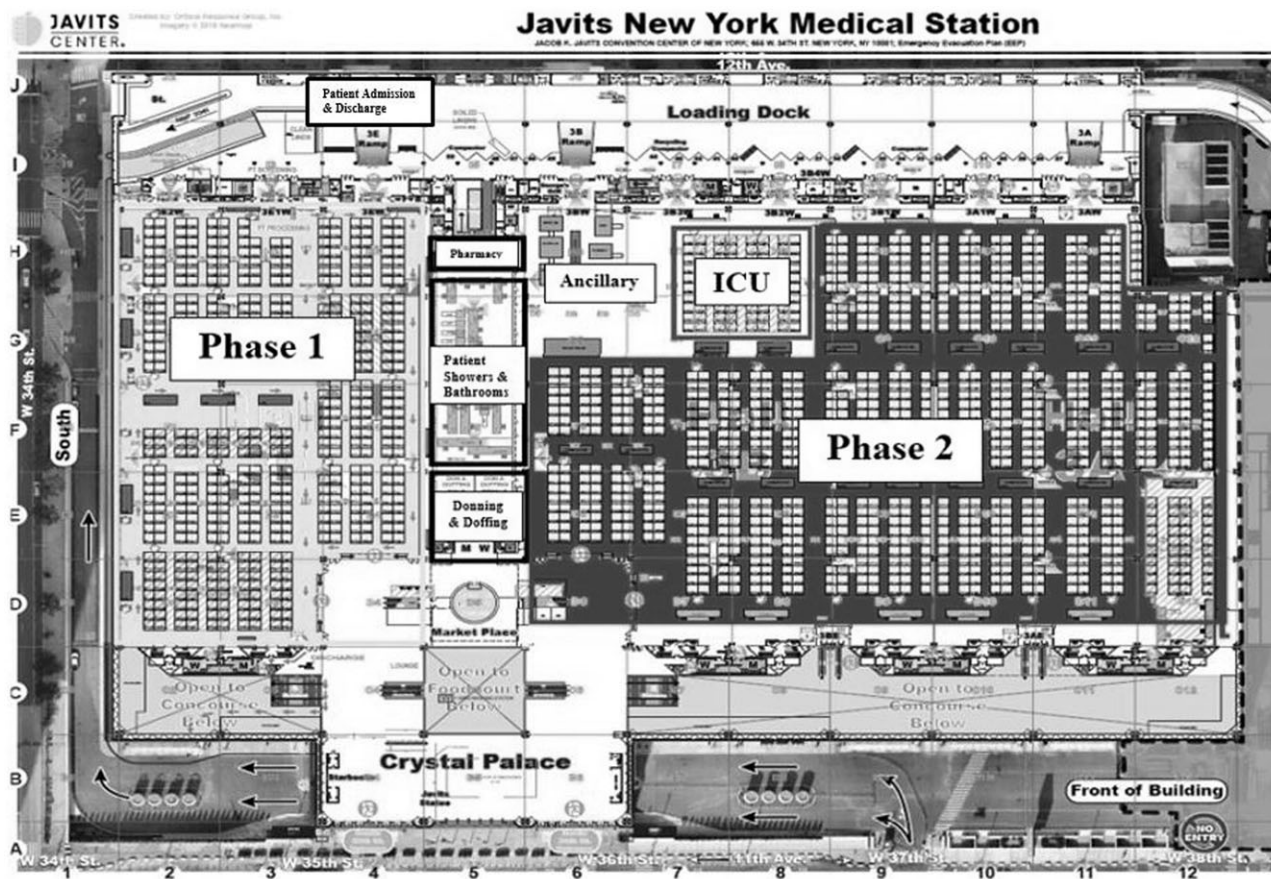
Javits New York medical station phase 1 and phase 2 floor plan.
